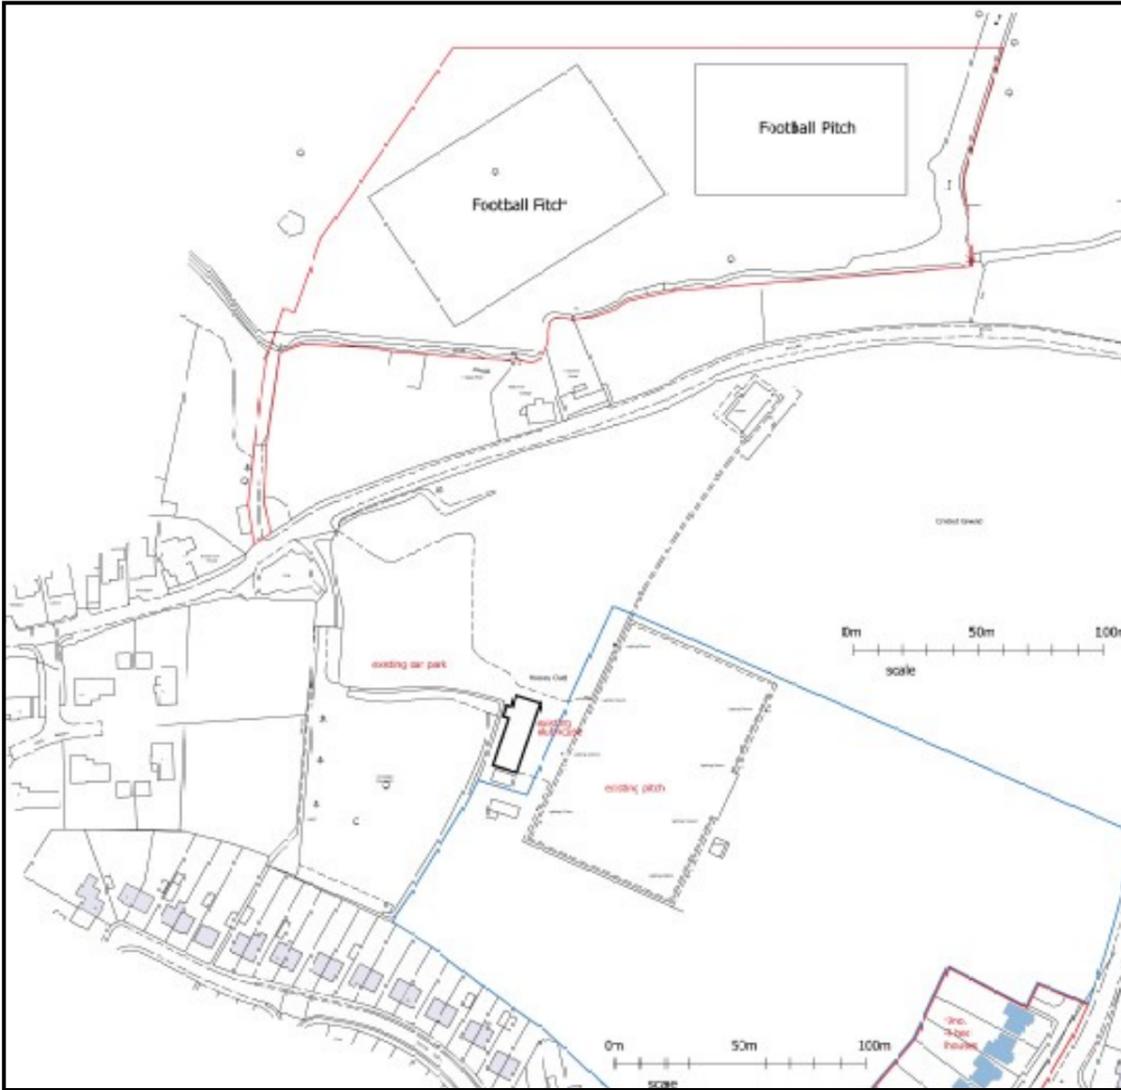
Wider Site Layout Plan including location of proposed replacement sports pitches to north of existing pitches accessed off of Ball Lane
